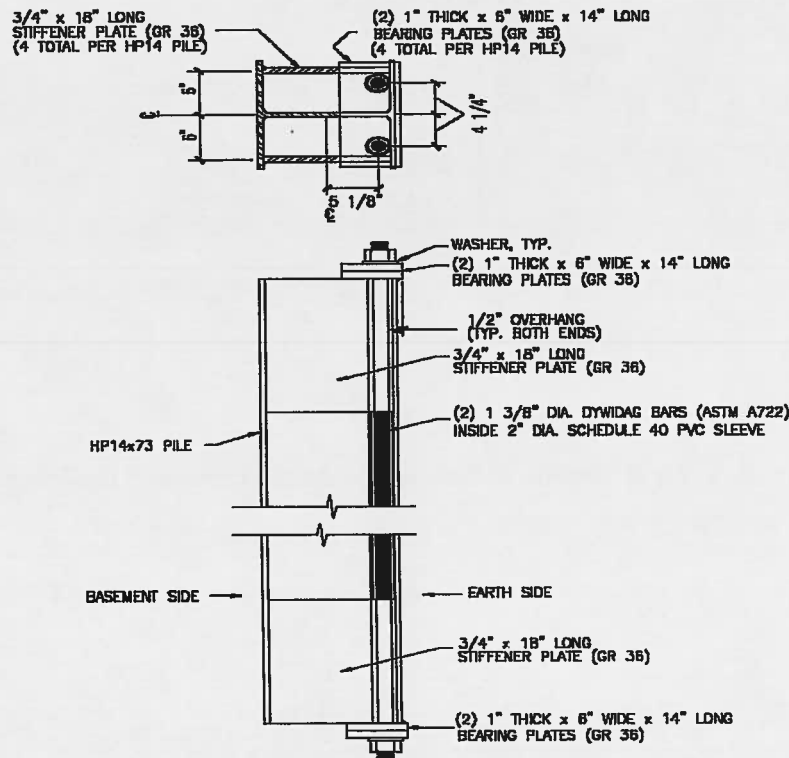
Typical Section for Vertically-Prestressed Cantilevered Pile along Parking Lot
